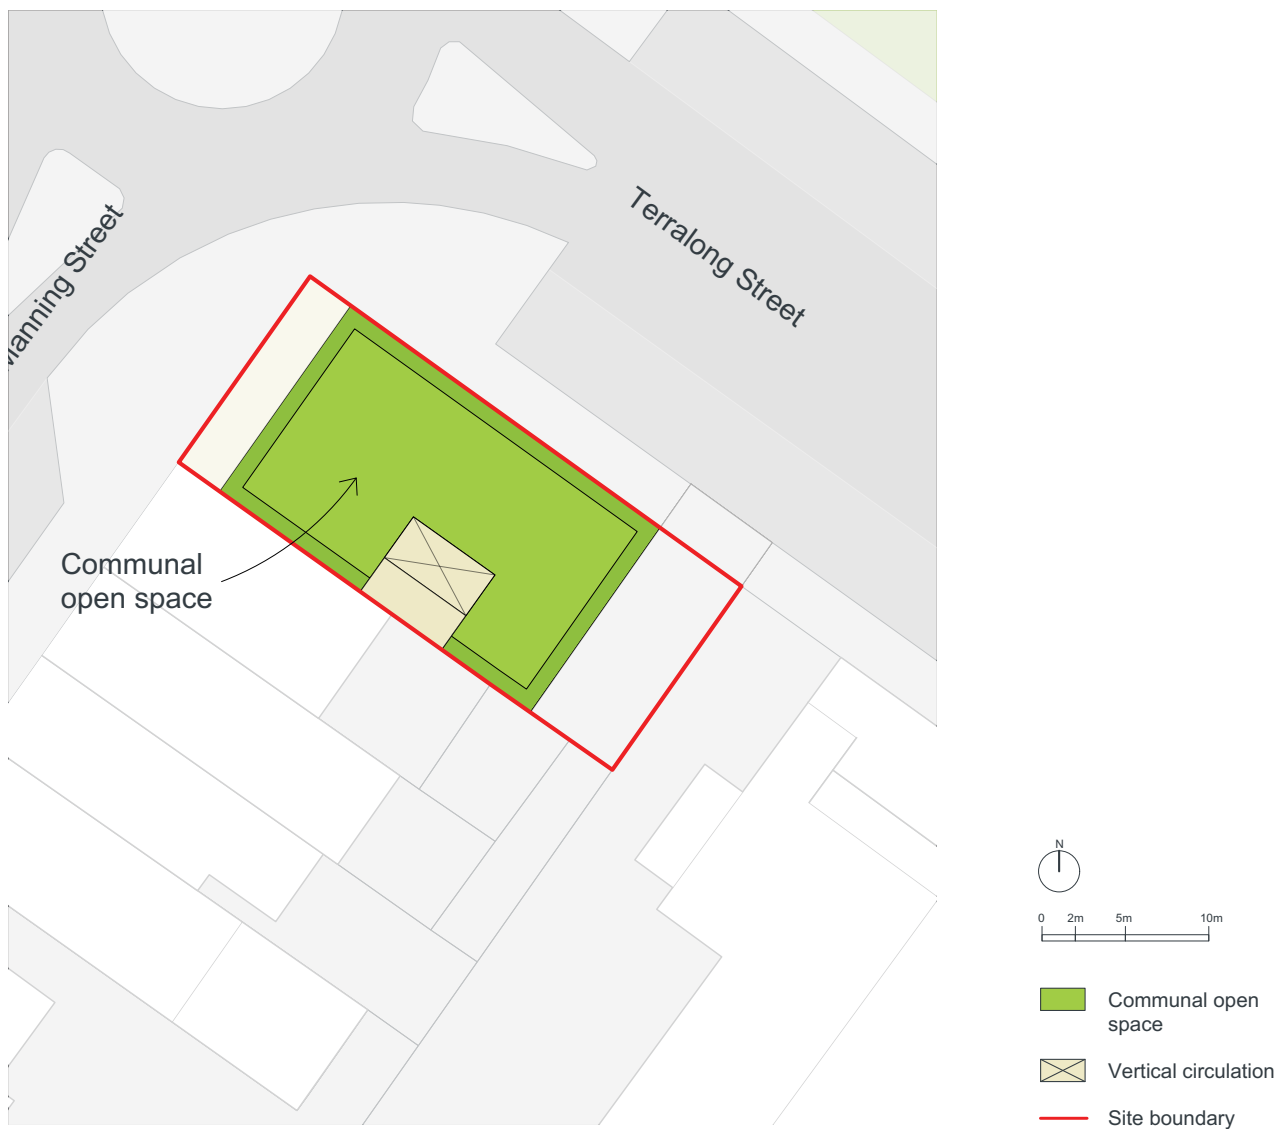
Commonwealth Bank - Site Layout Plan Rooftop Level
